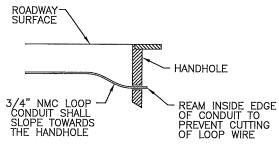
DETAIL FOR LOOP INSTALLATION IN NEW ROADWAY
